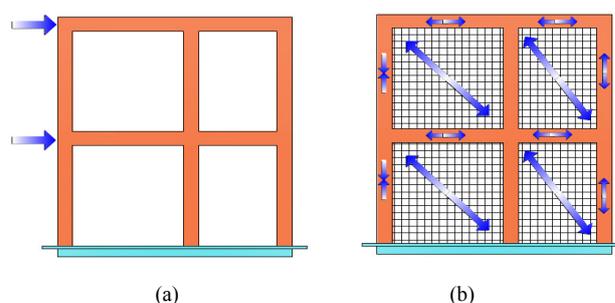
Change in the lateral load transfer mechanism owing to inclusion of masonry in-fill walls: (a) frame action in bare frame and (b) predominant truss action in in-filled frame.
